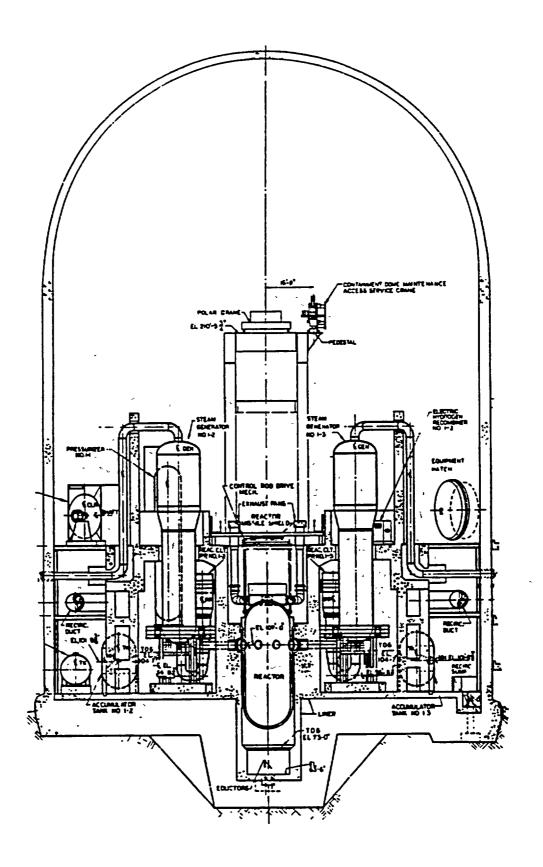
Section Views of the Diablo Canyon Large, Dry Containment (Reinforced Concrete)
